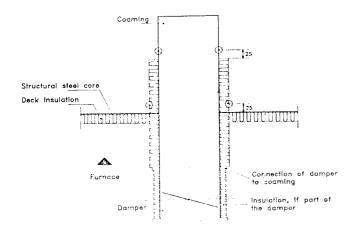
FIGURE AT FIRE DAMPERS - INSULATION ON TEST SPECIMENS AND POSITION OF UNEXPOSED FACE THEPROCOUPLES
